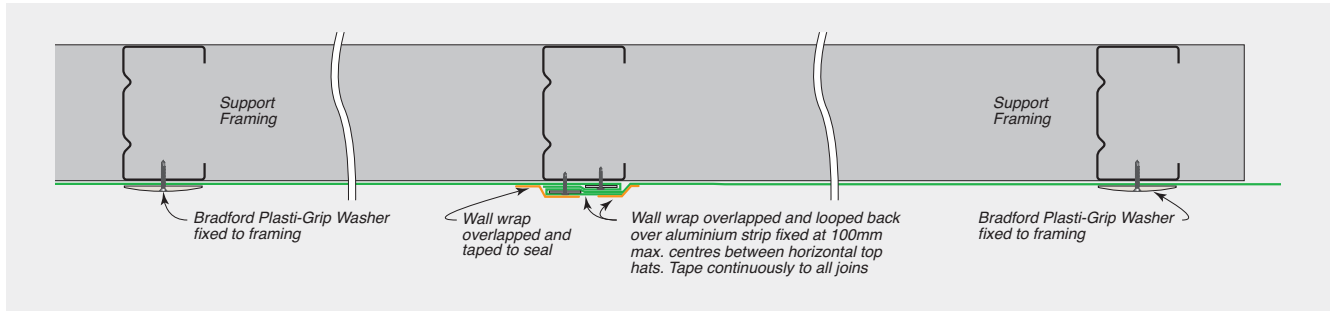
Vertical Wall Wrap Junction – Overlapped Single Strip Join
